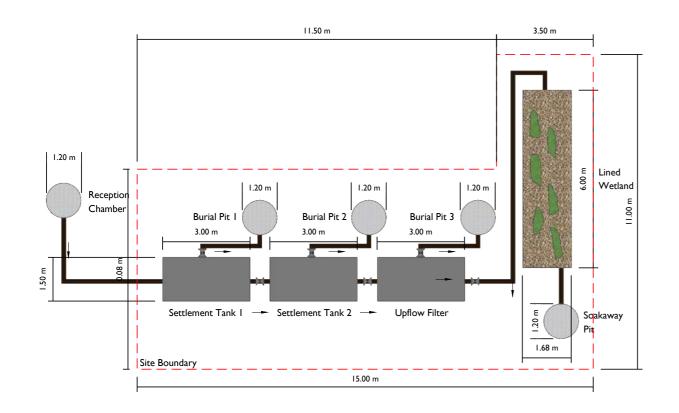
Site layout plan - Upflow Filter plant 2 (NGO 1)
